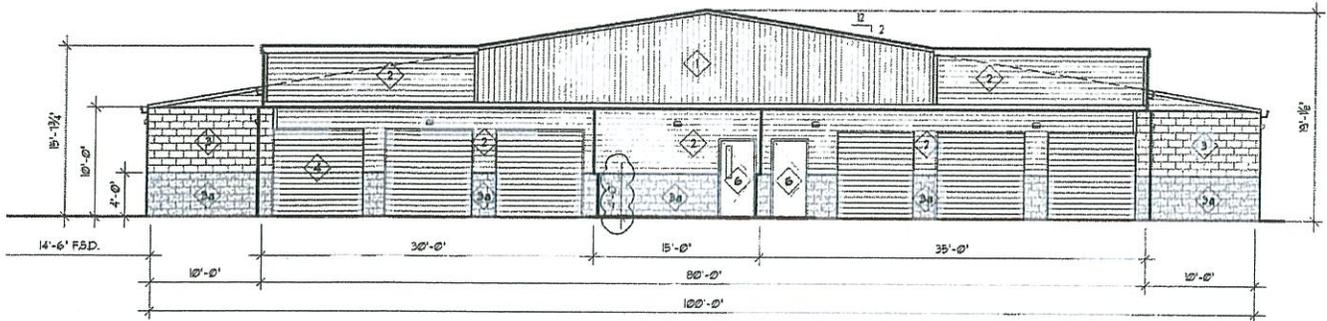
Building #7 and 10 Storage Buildings- View from SR 410; North Elevation (proposed amended)
